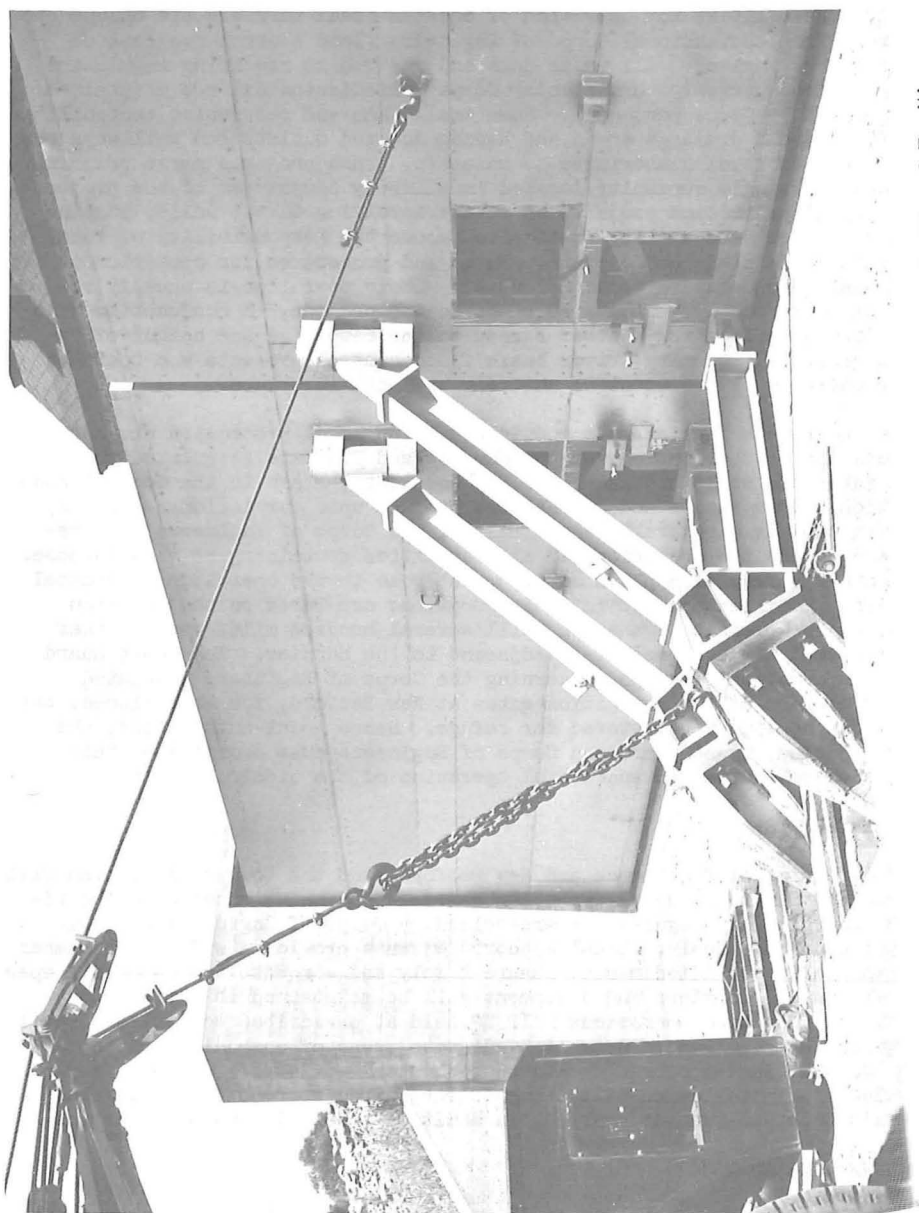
Providence, R. I. - Fox Point Hurricane Barrier - Street Gates in Closed Position
